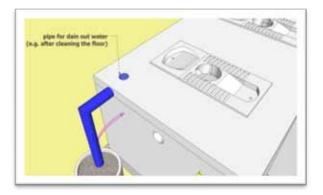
Arrangement for Fixing of Drain Pipe for Floor
